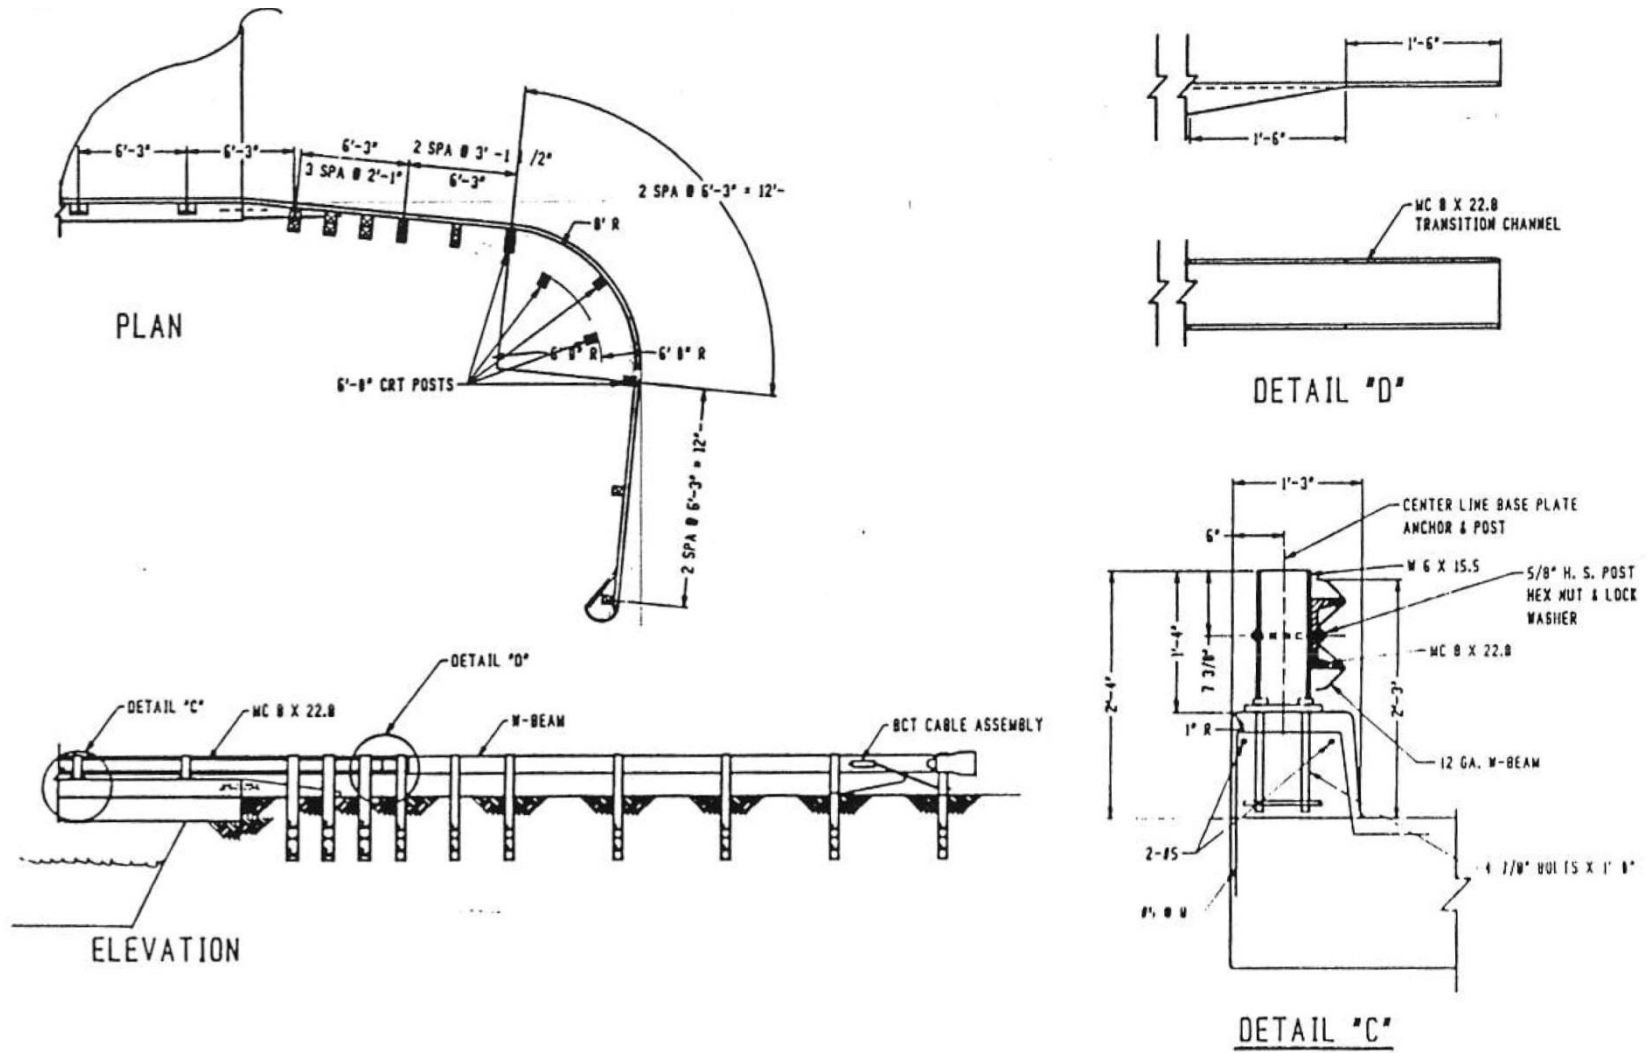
Construction Drawings, Yuma County Short Radius Guardrail System [6]
